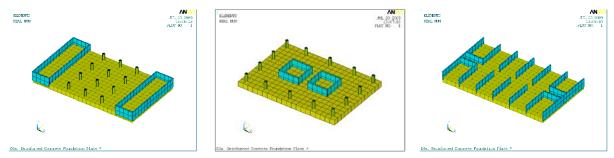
Calculation models of foundation plate – D1, D2 and D3.
